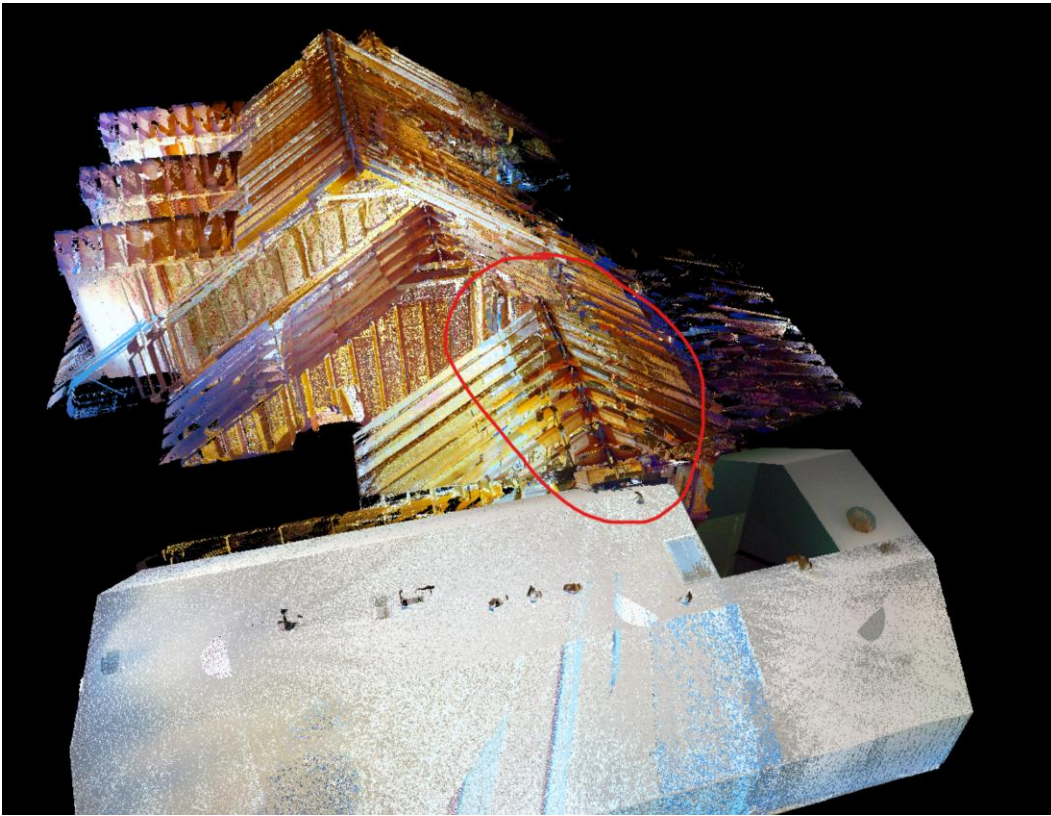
Overall Roof Geometry and Attic Location (Point-Cloud View)
